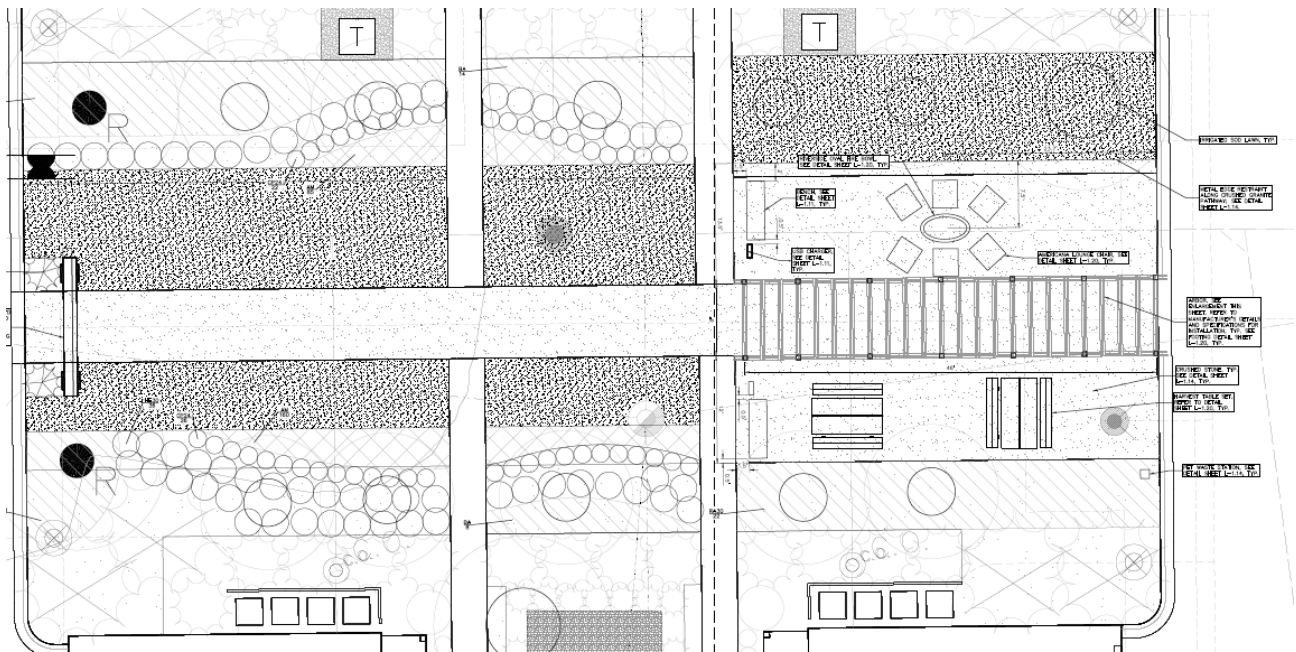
Eastern garden area between the townhouses showing plantings, seating, picnic tables and pergola
